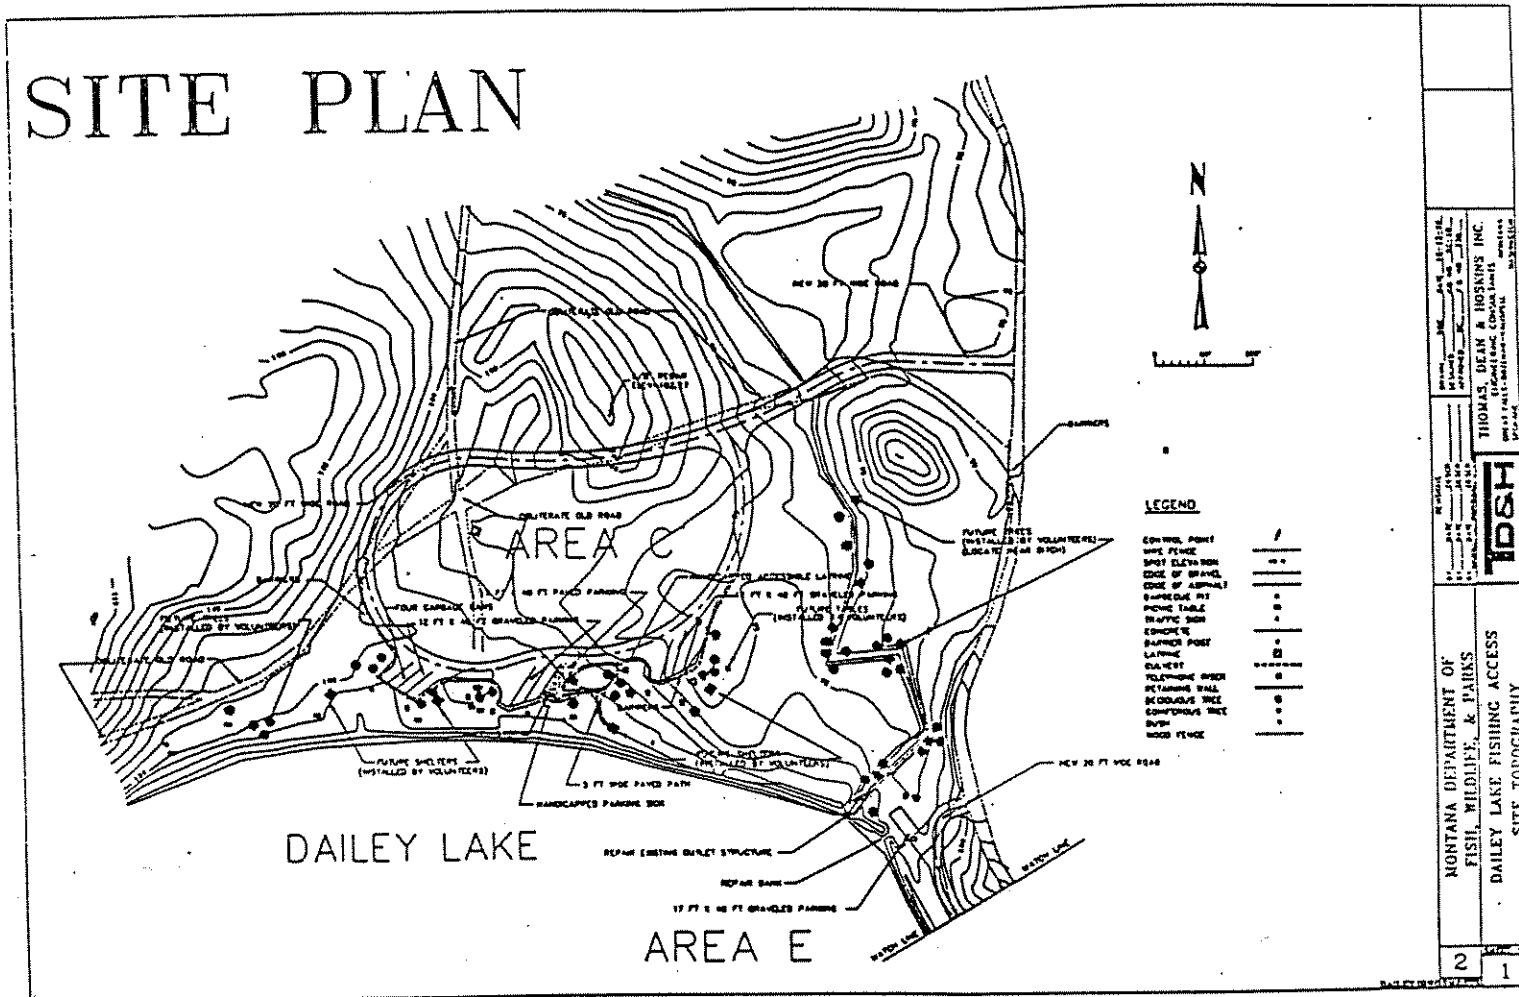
Detail of modifications completed in 1994 in construction areas C and E (site drawing from Thomas, Dean, and Hoskins, Inc.).
